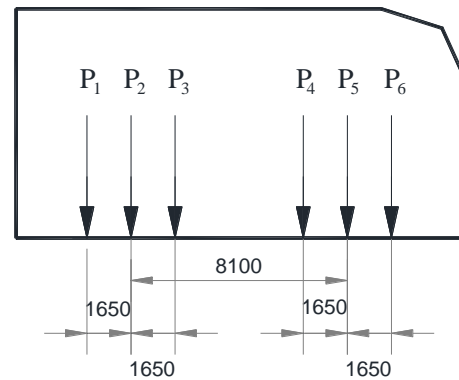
The load arrangement diagram for locomotive D19E (Dimensions in the drawing is in mm).
